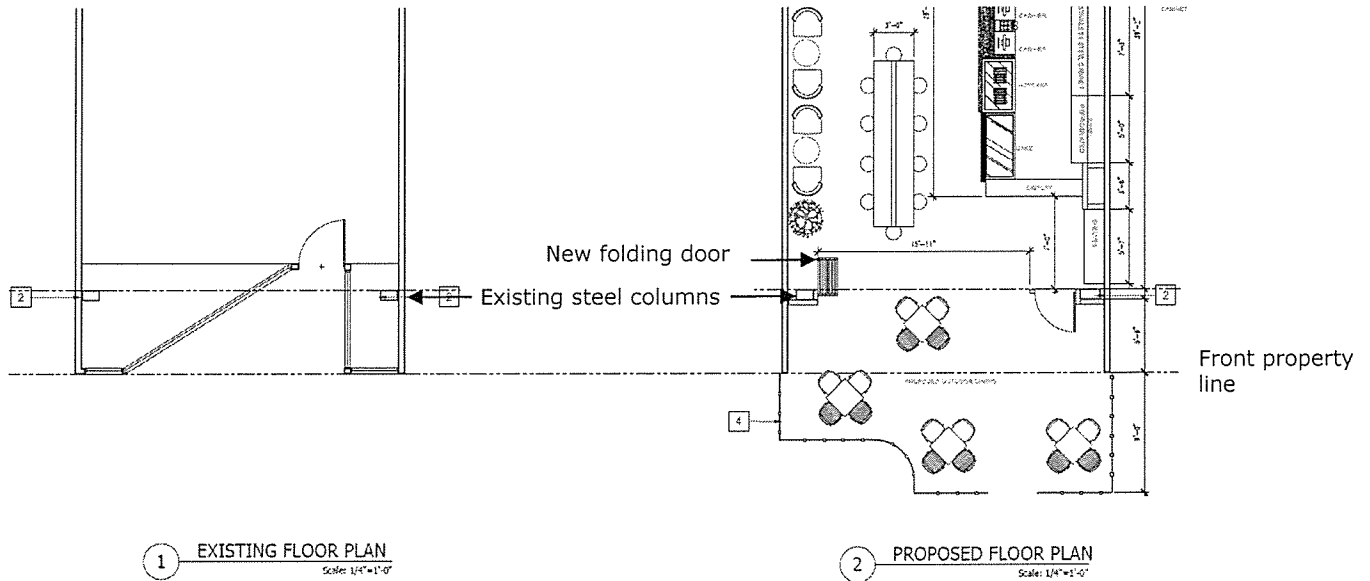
The existing floor plan on the left shows the location of the existing windows and door. The proposed floor plan on the right shows the location where the new folding door system and the new swing door will be installed. The new entrance will be set back six feet (6'-0") from the front property line. As a result, the roof will become cantilevered creating a new open patio area underneath, which will become a new outdoor seating area for the coffee shop.
